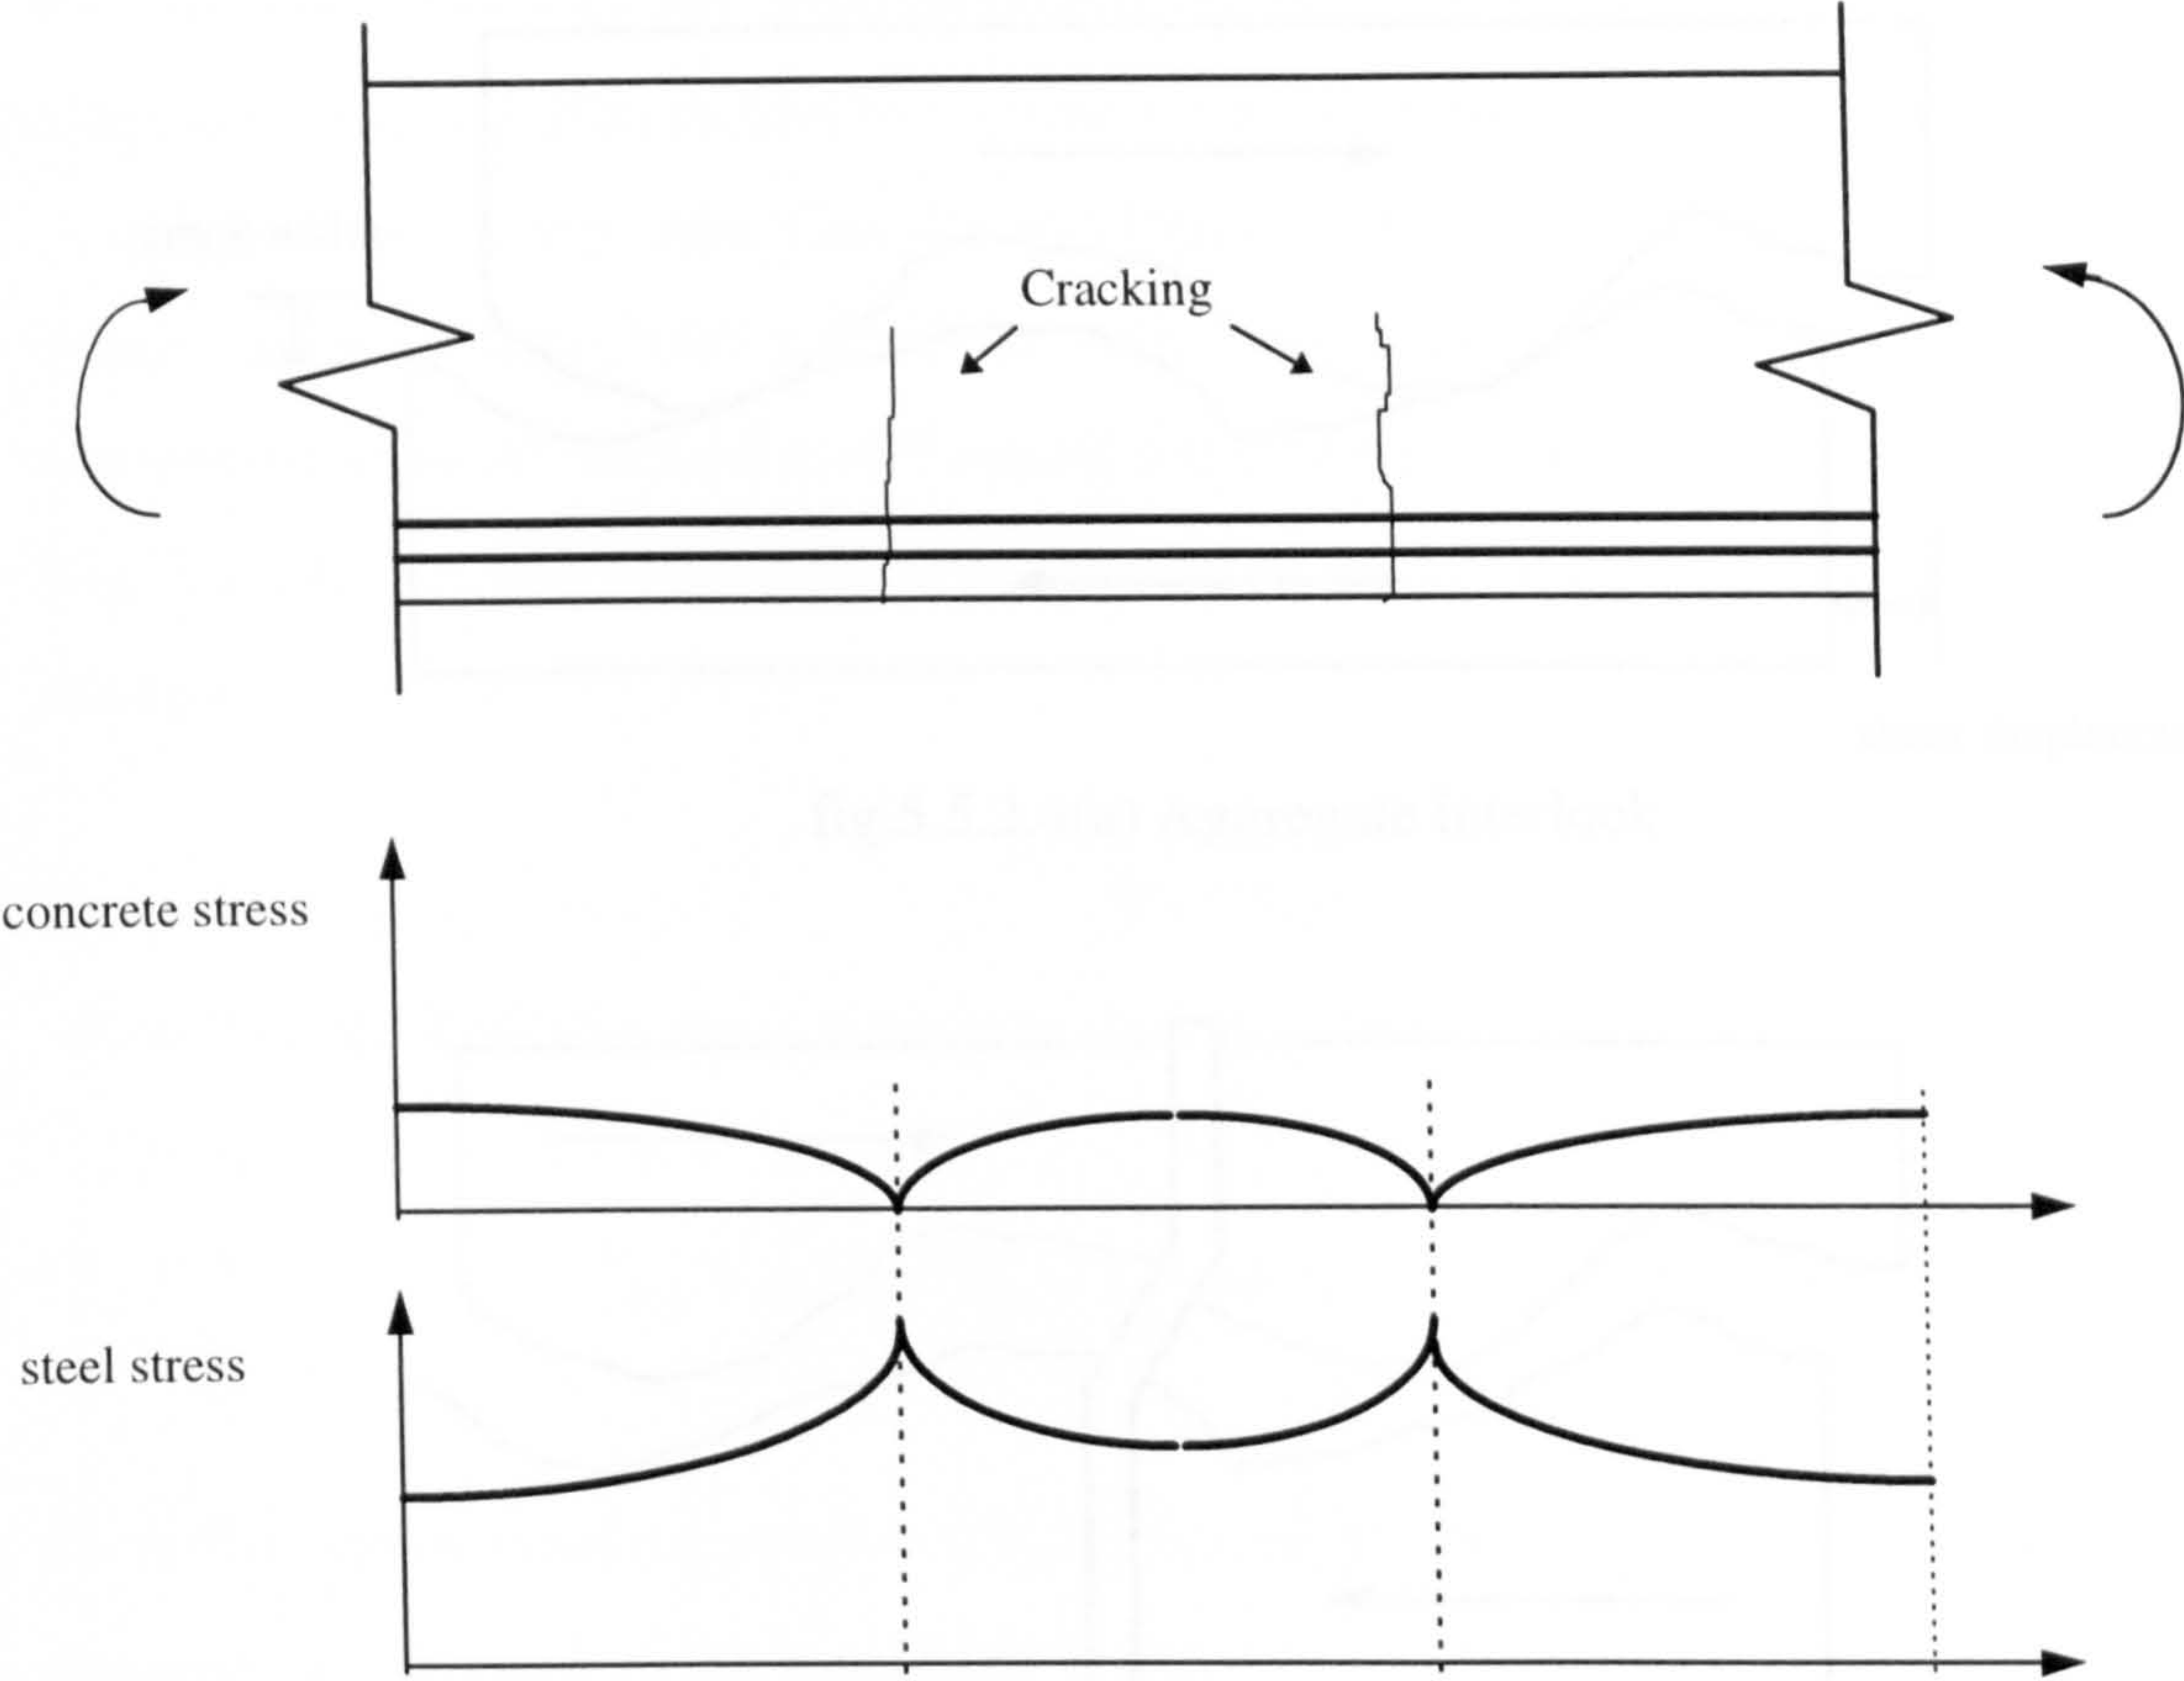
(a) Stress distribution in a cracked reinforced concrete beam
